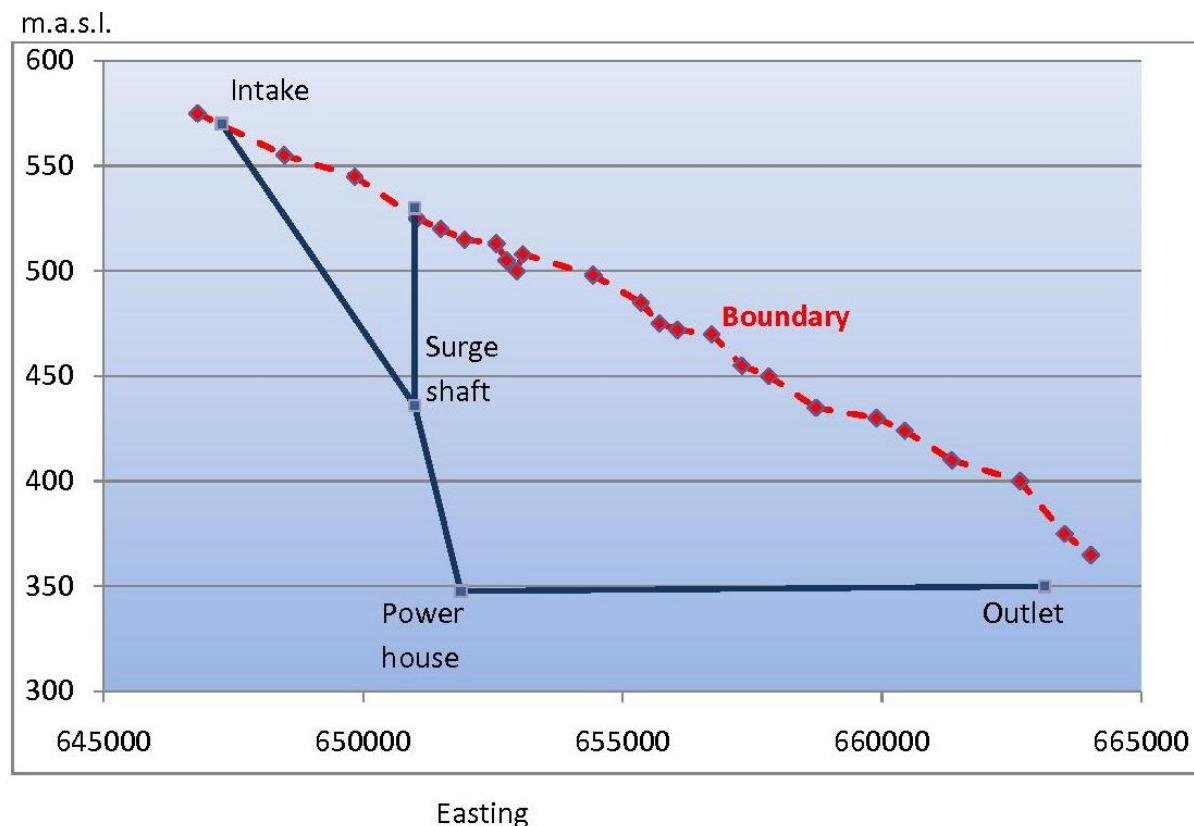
East – west section with projection of boundary between the Precambrian basement rock and overlying Jurassic-Cretaceous sedimentary rocks, and of tunnel system.
